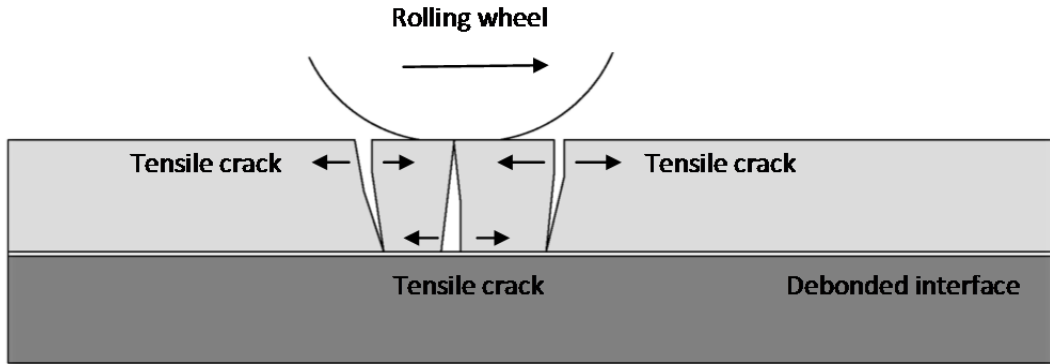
Schematic tensile cracks in the debonded surface layer due to a rolling wheel.
